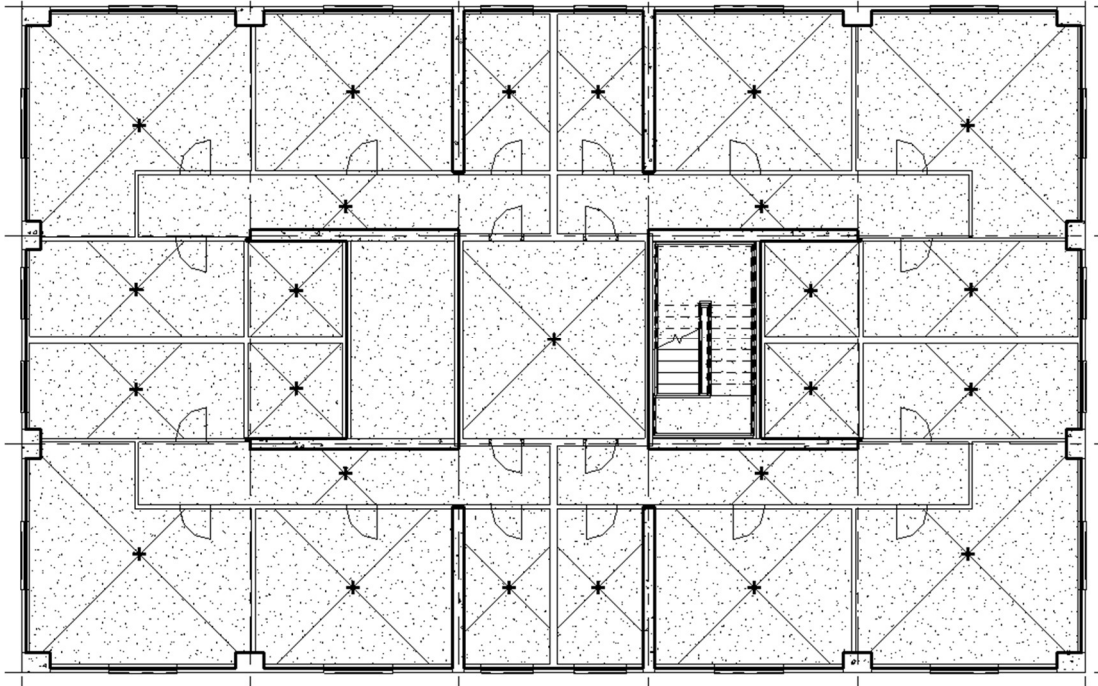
The layout of reinforced concrete system with shear wall prototype 2
